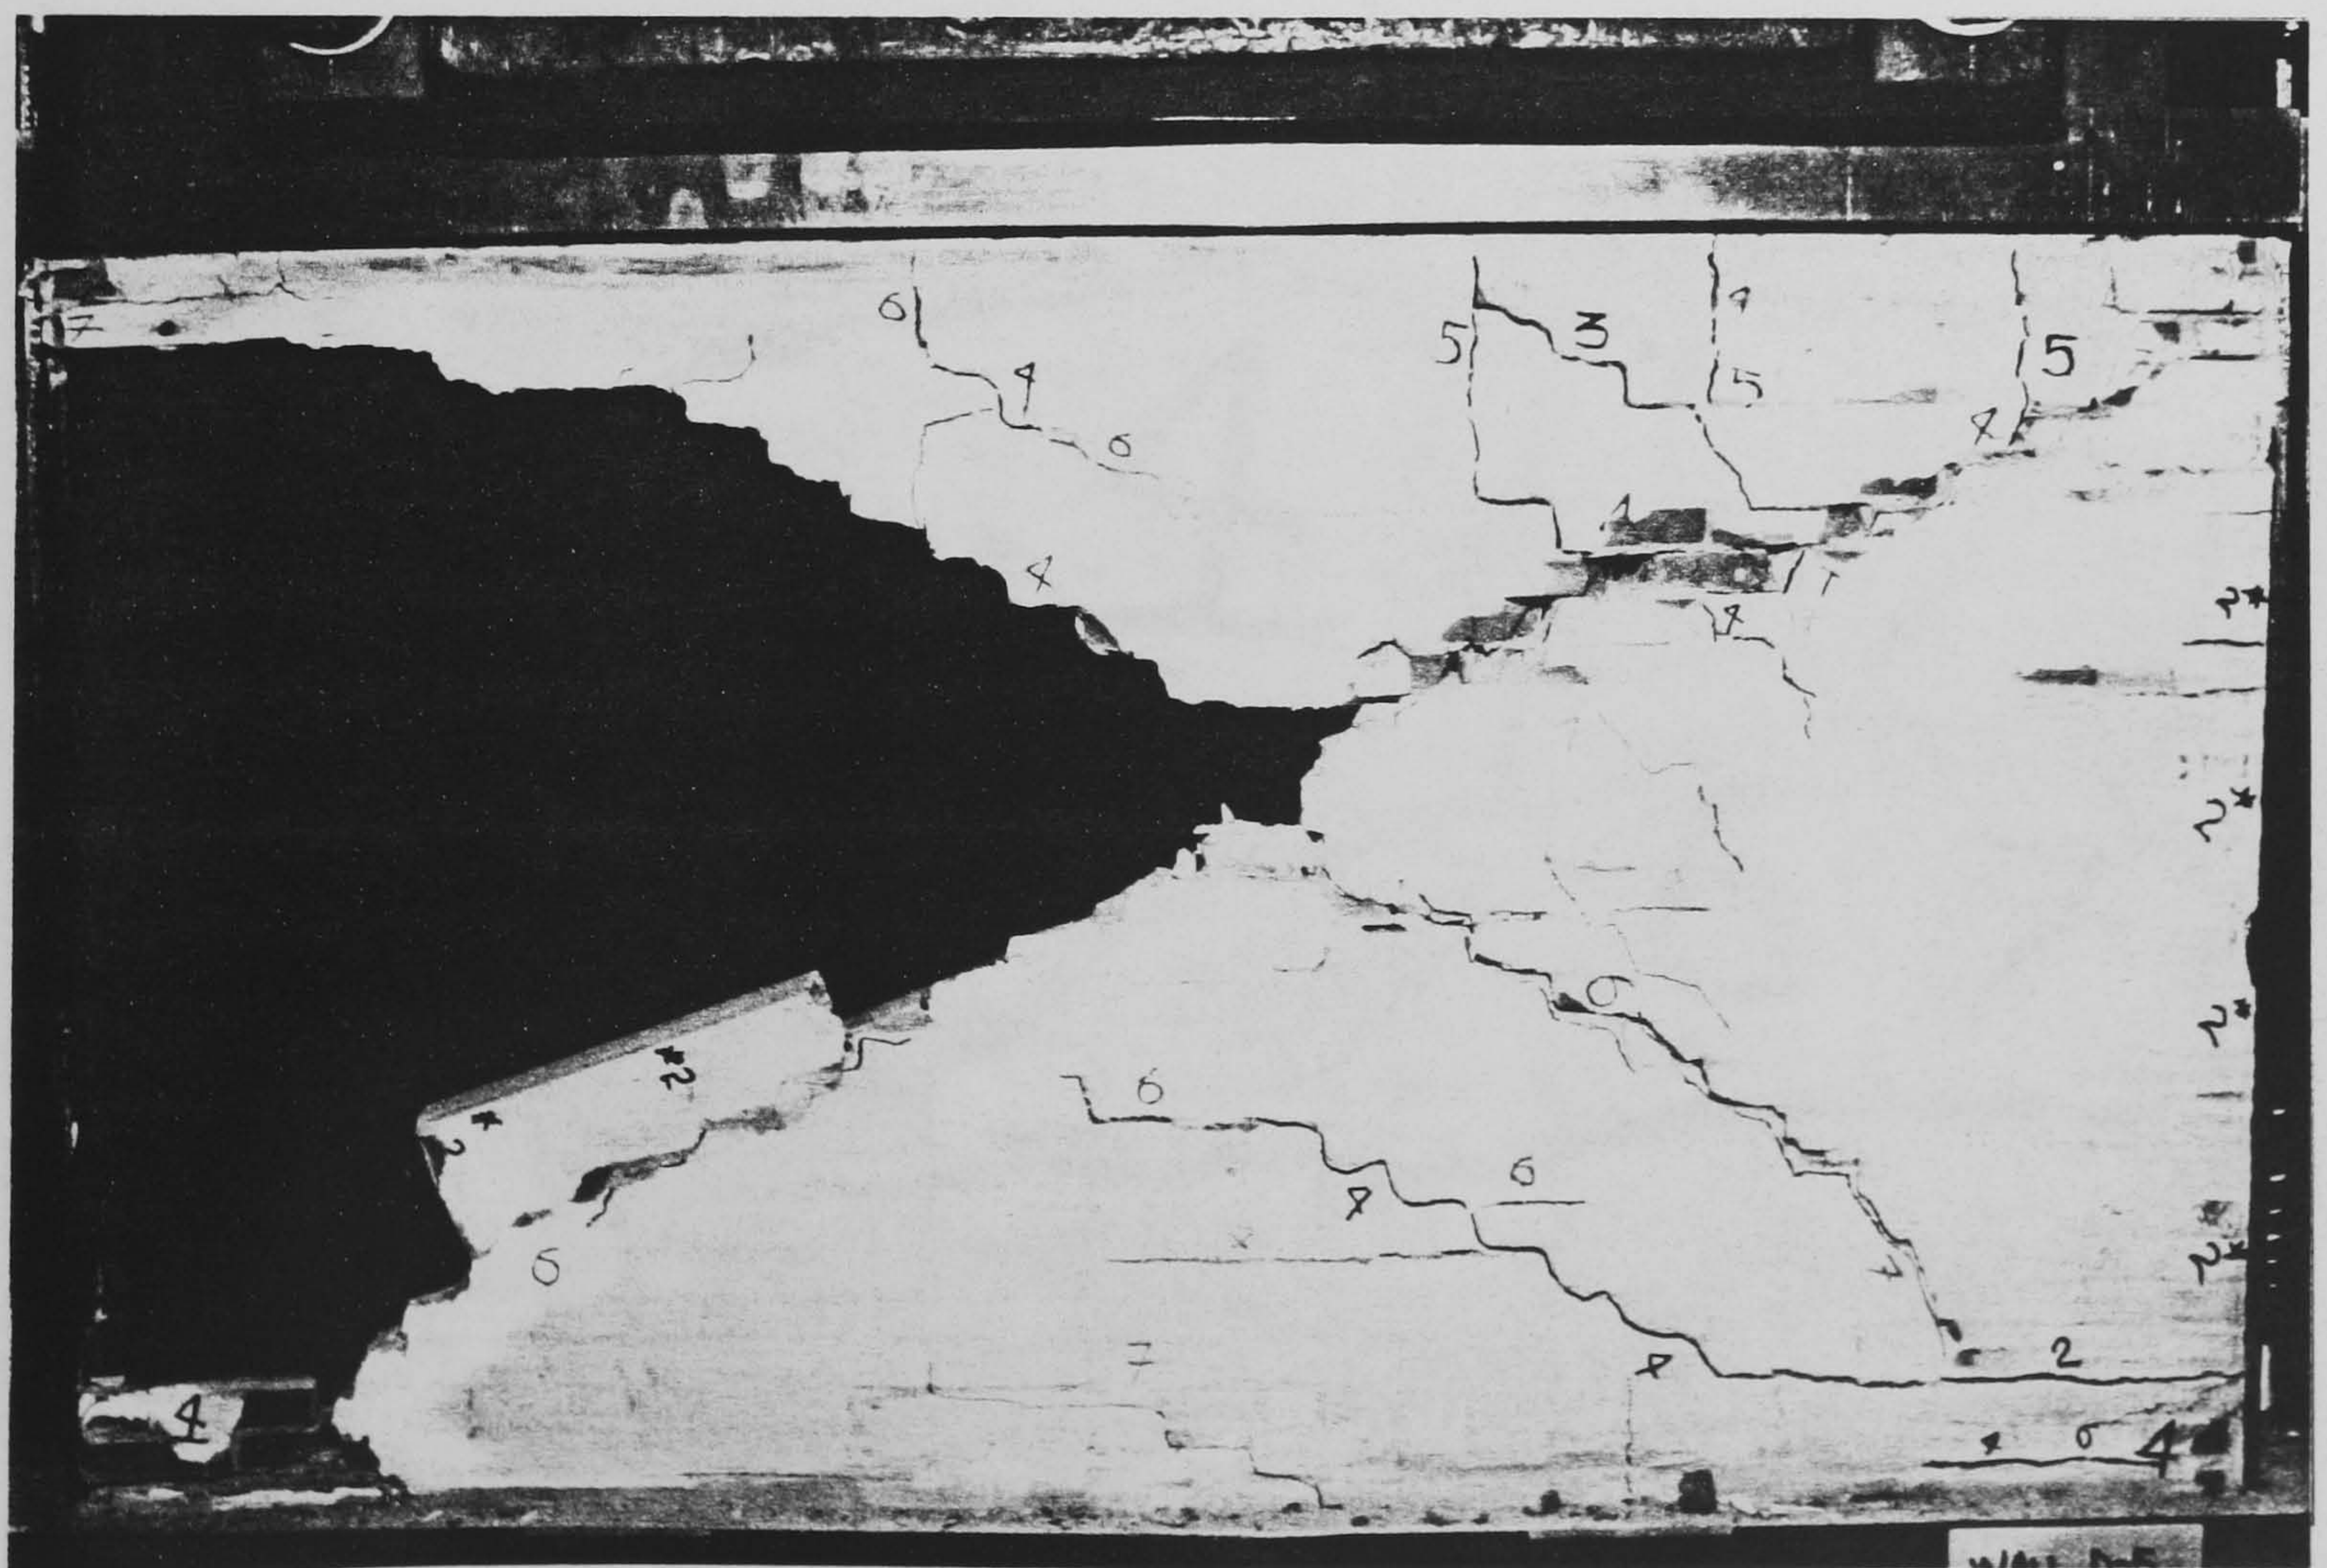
Cross shaped final diagonal failure and collapse (wall-D)
